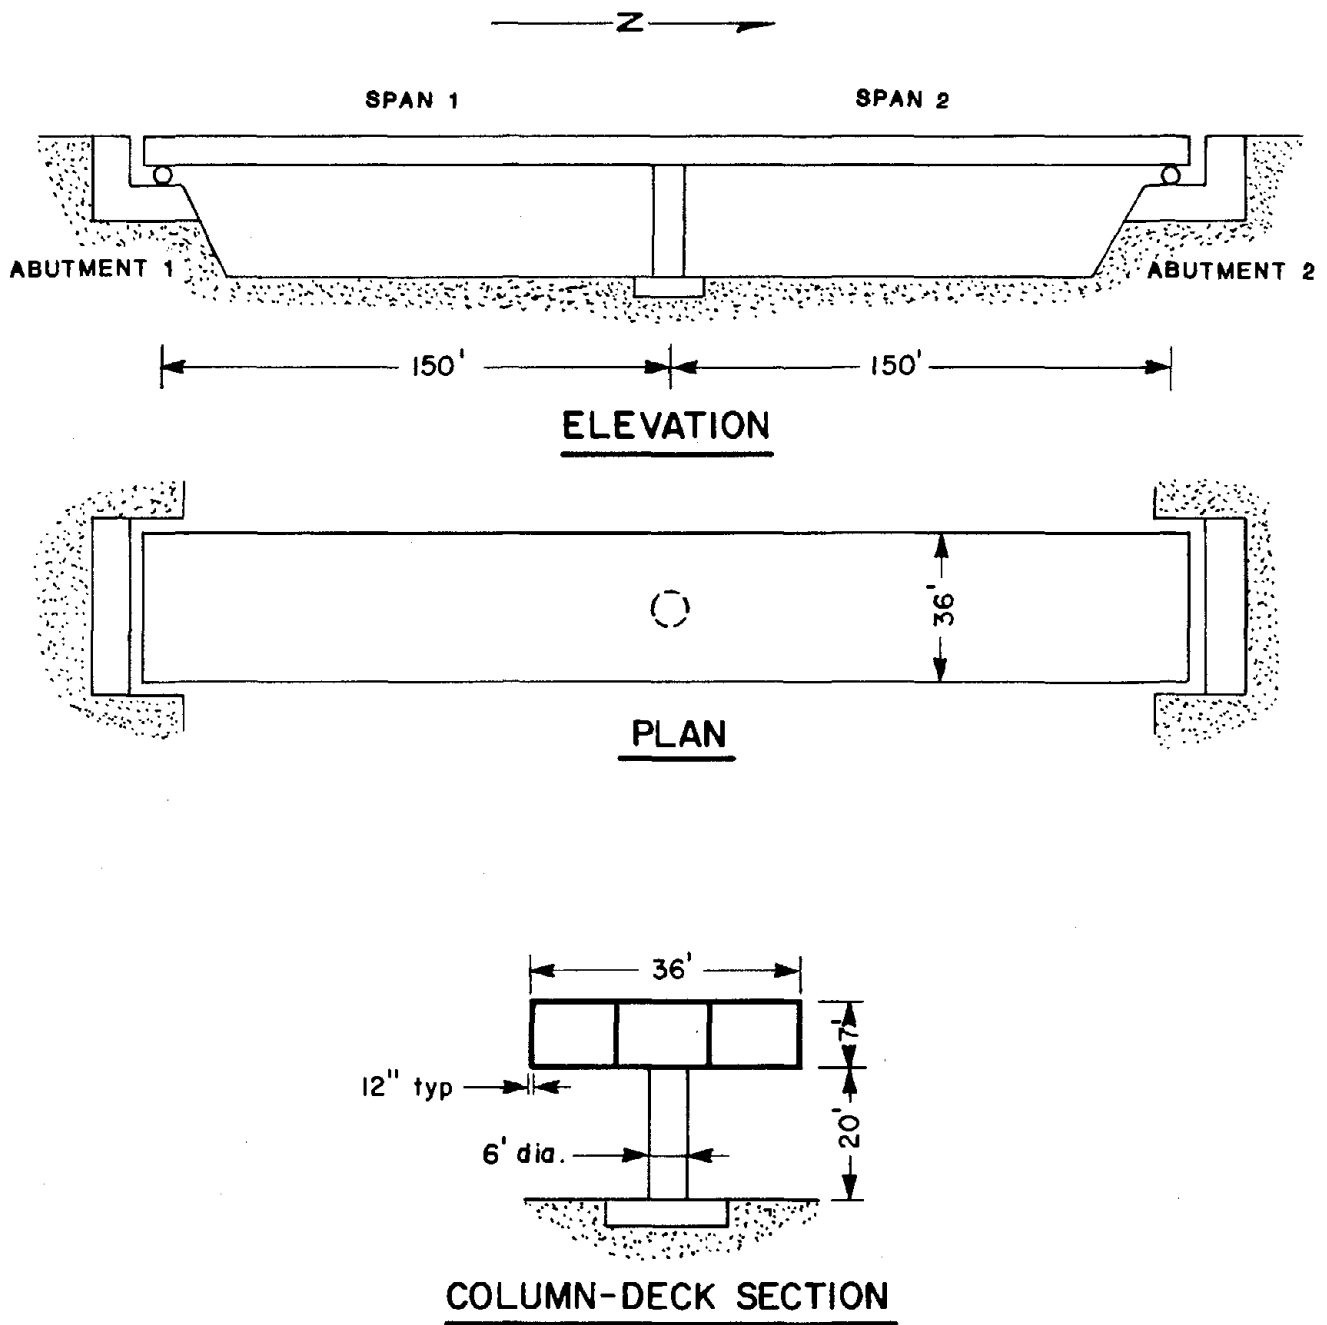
Continuous two-span bridge plan, section, and elevation views.
